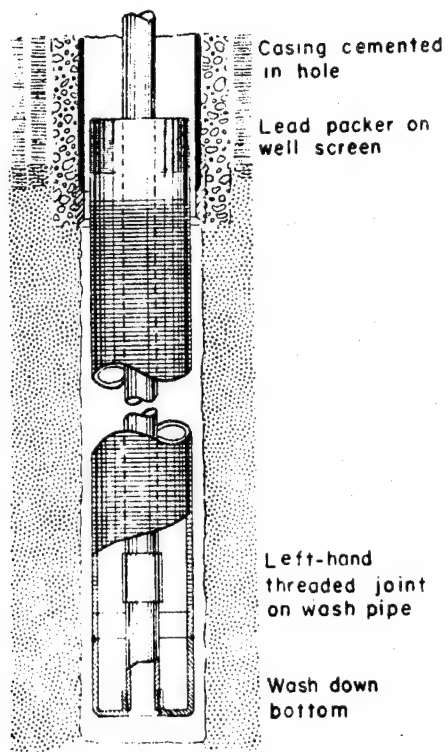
Simple Design Of Wash-Down Bottom Without Valve.⁸
